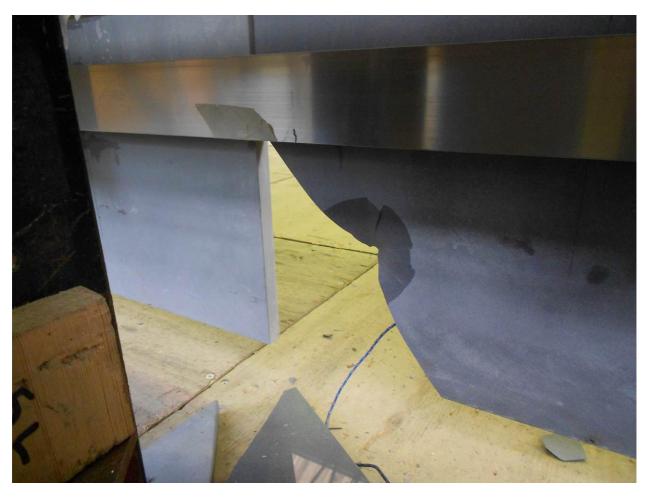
Typical damage after hard body impact on 20 mm thick panels – near a corner of the panel.
